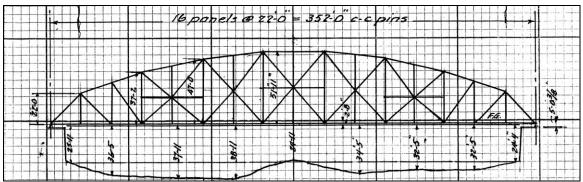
Sketch of truss members showing extra vertical and horizontal members that define the Pratt truss subtype known as the "Pennsylvania Truss" (NHDOT 1941).
